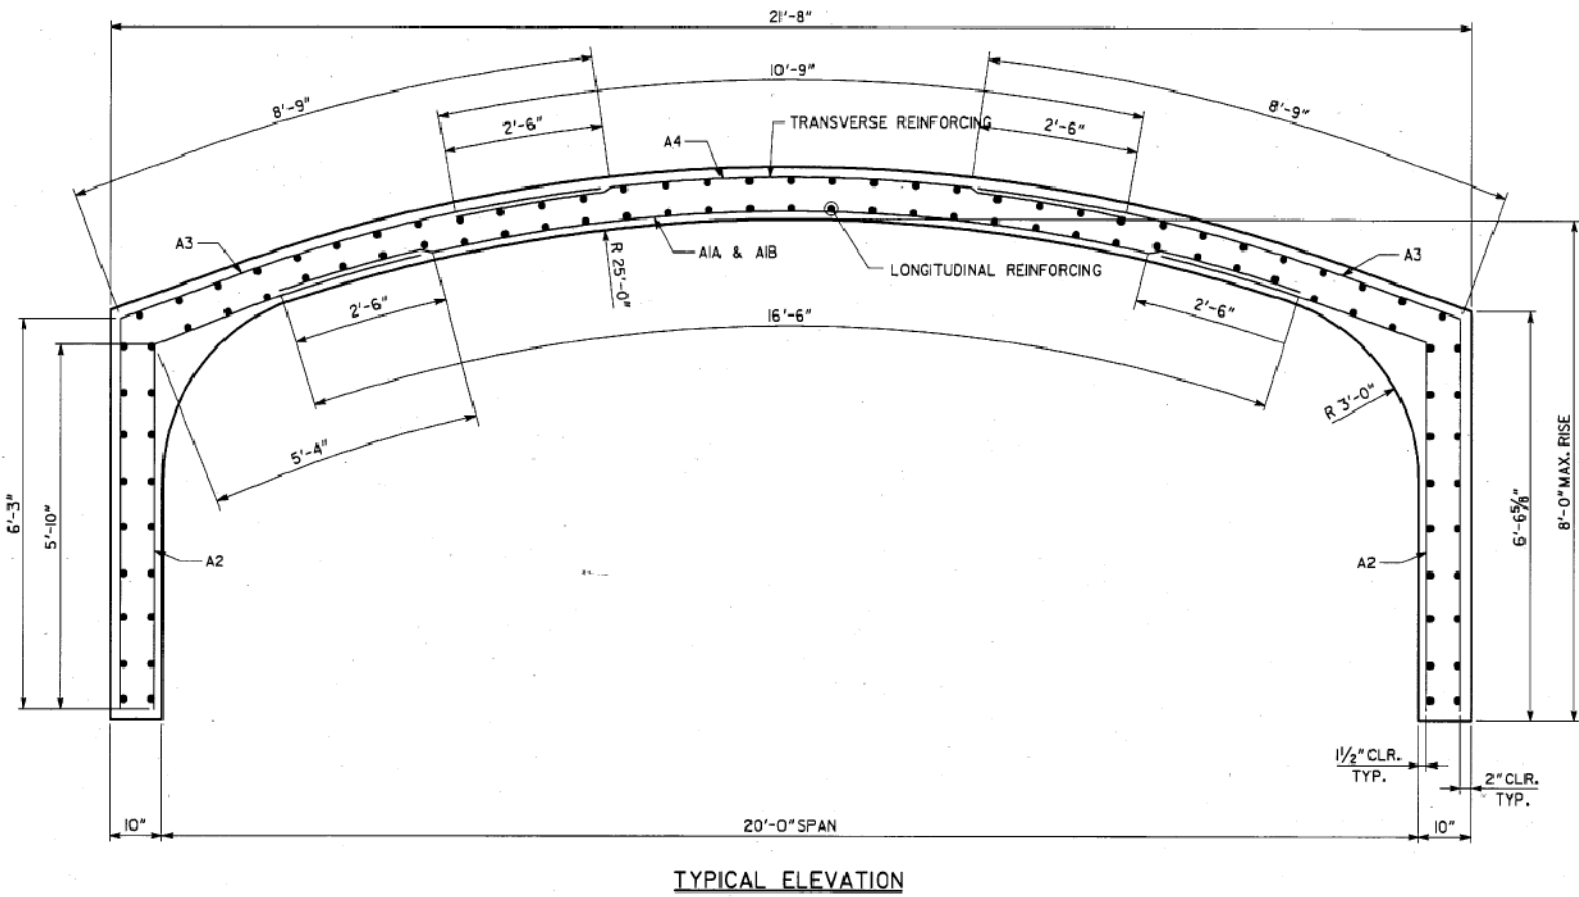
20 ft Bridge Unit Reinforcement Layout (Foley Arch, 2010b)
